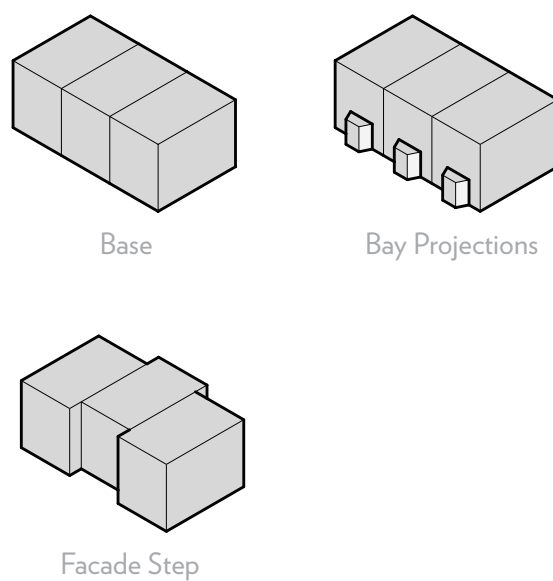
Typical Townhouse Base Massing and Facade Articulation
